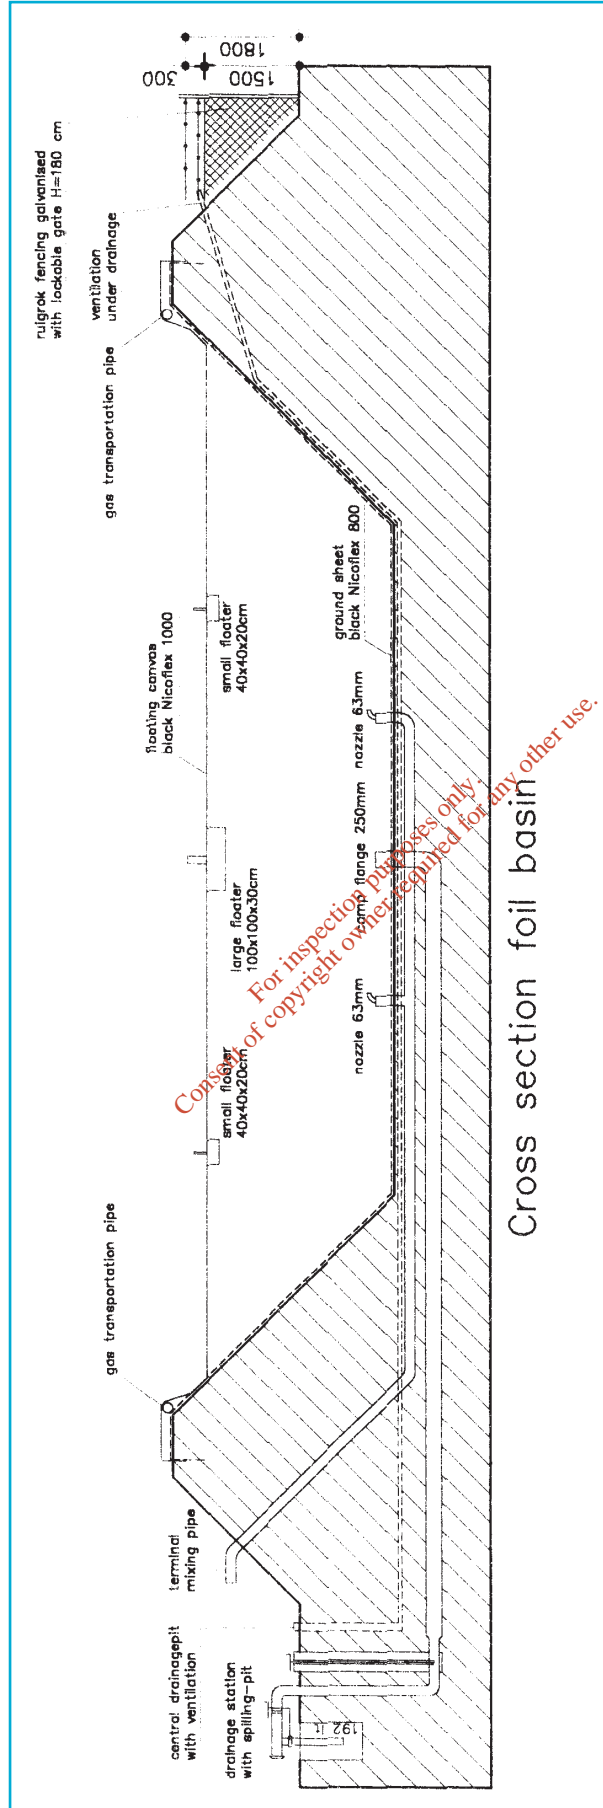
Fully enclosed slurry storage in earth shape with 1mm reinforced PVC lining
